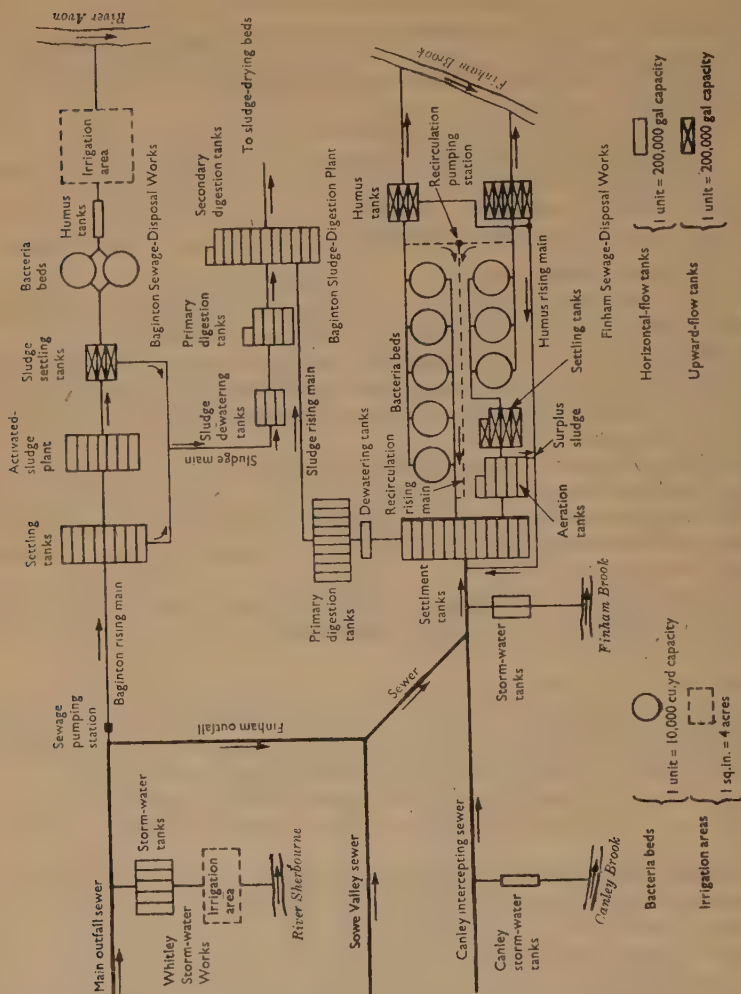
GENERAL ARRANGEMENT OF SEWAGE TREATMENT FACILITIES IN THE CITY OF COVENTRY
